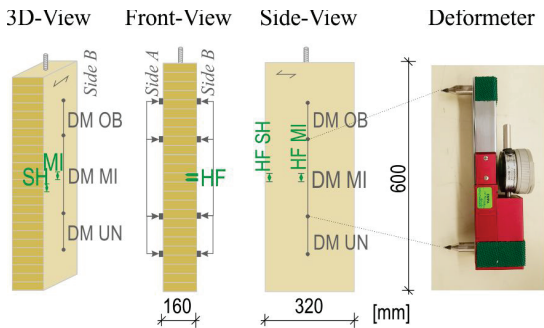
Illustration of the positions and naming of the measurement of deformations on the wood surface of glulam beams as 3D-, front- and side view using the deformer (right)
